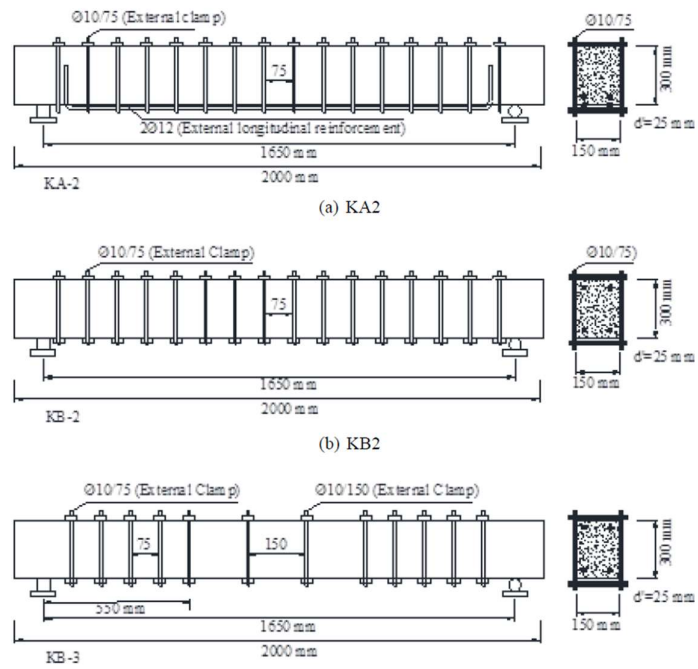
Types and shapes of steel member used in strengthening (Demir et al. 2018).
